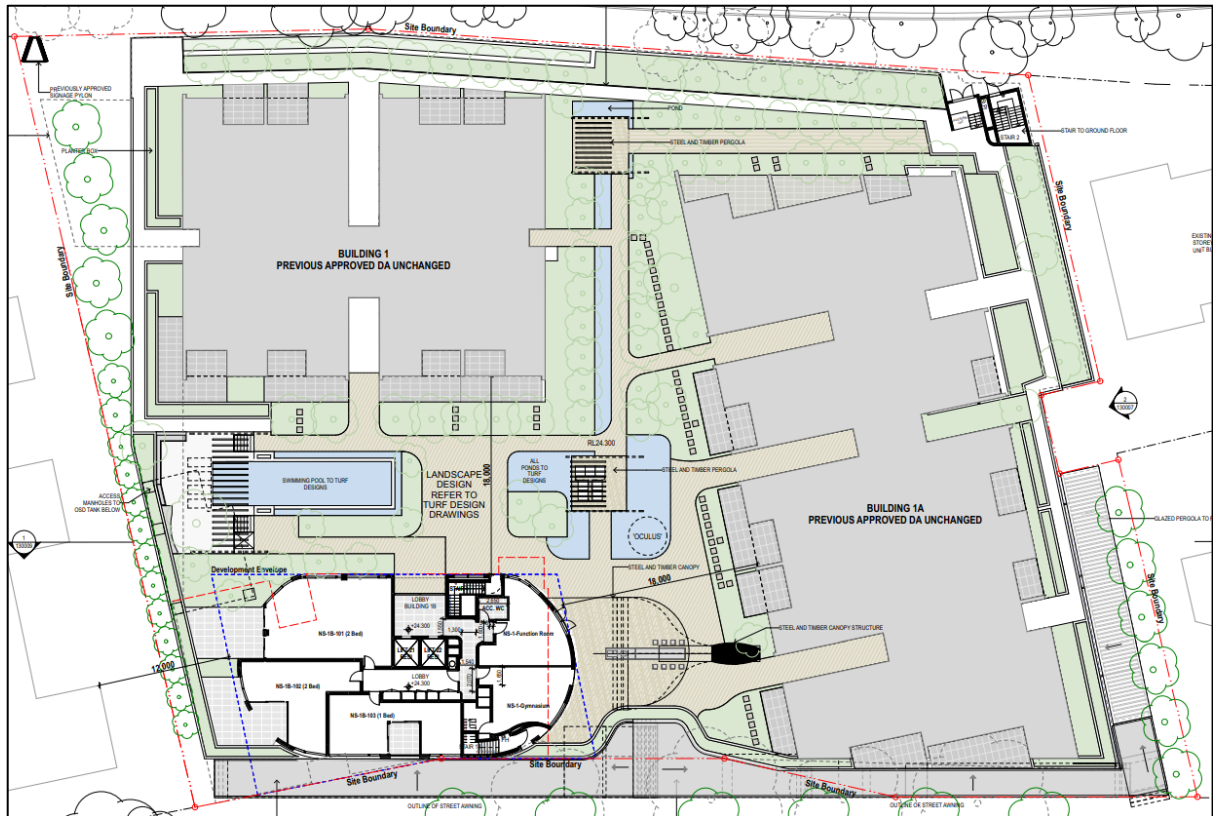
| North Site layout approved by MOD 1 (Source: MP09_0146 MOD 1 approved plans)
